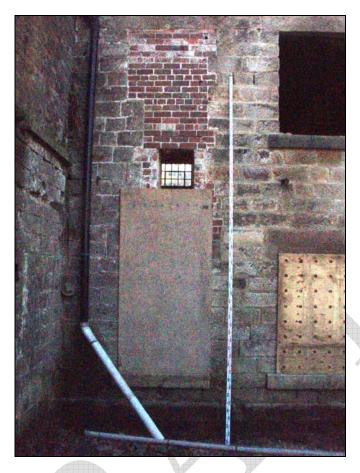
Photograph of infilling of the wall and one of the windows in the north-east façade of Scholes Mill, Tansley (facing south-west).
